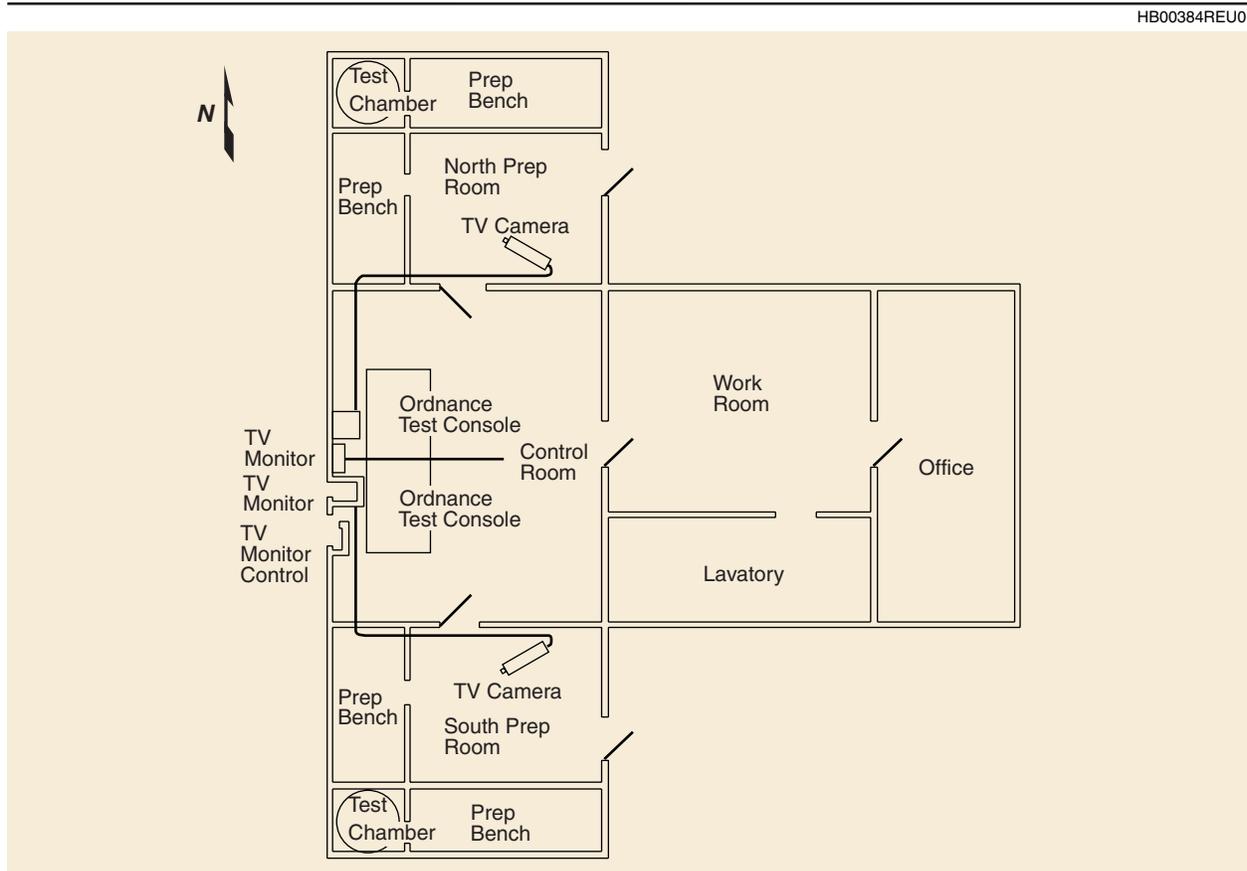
Electrical-Mechanical Testing Building Floor Plan
